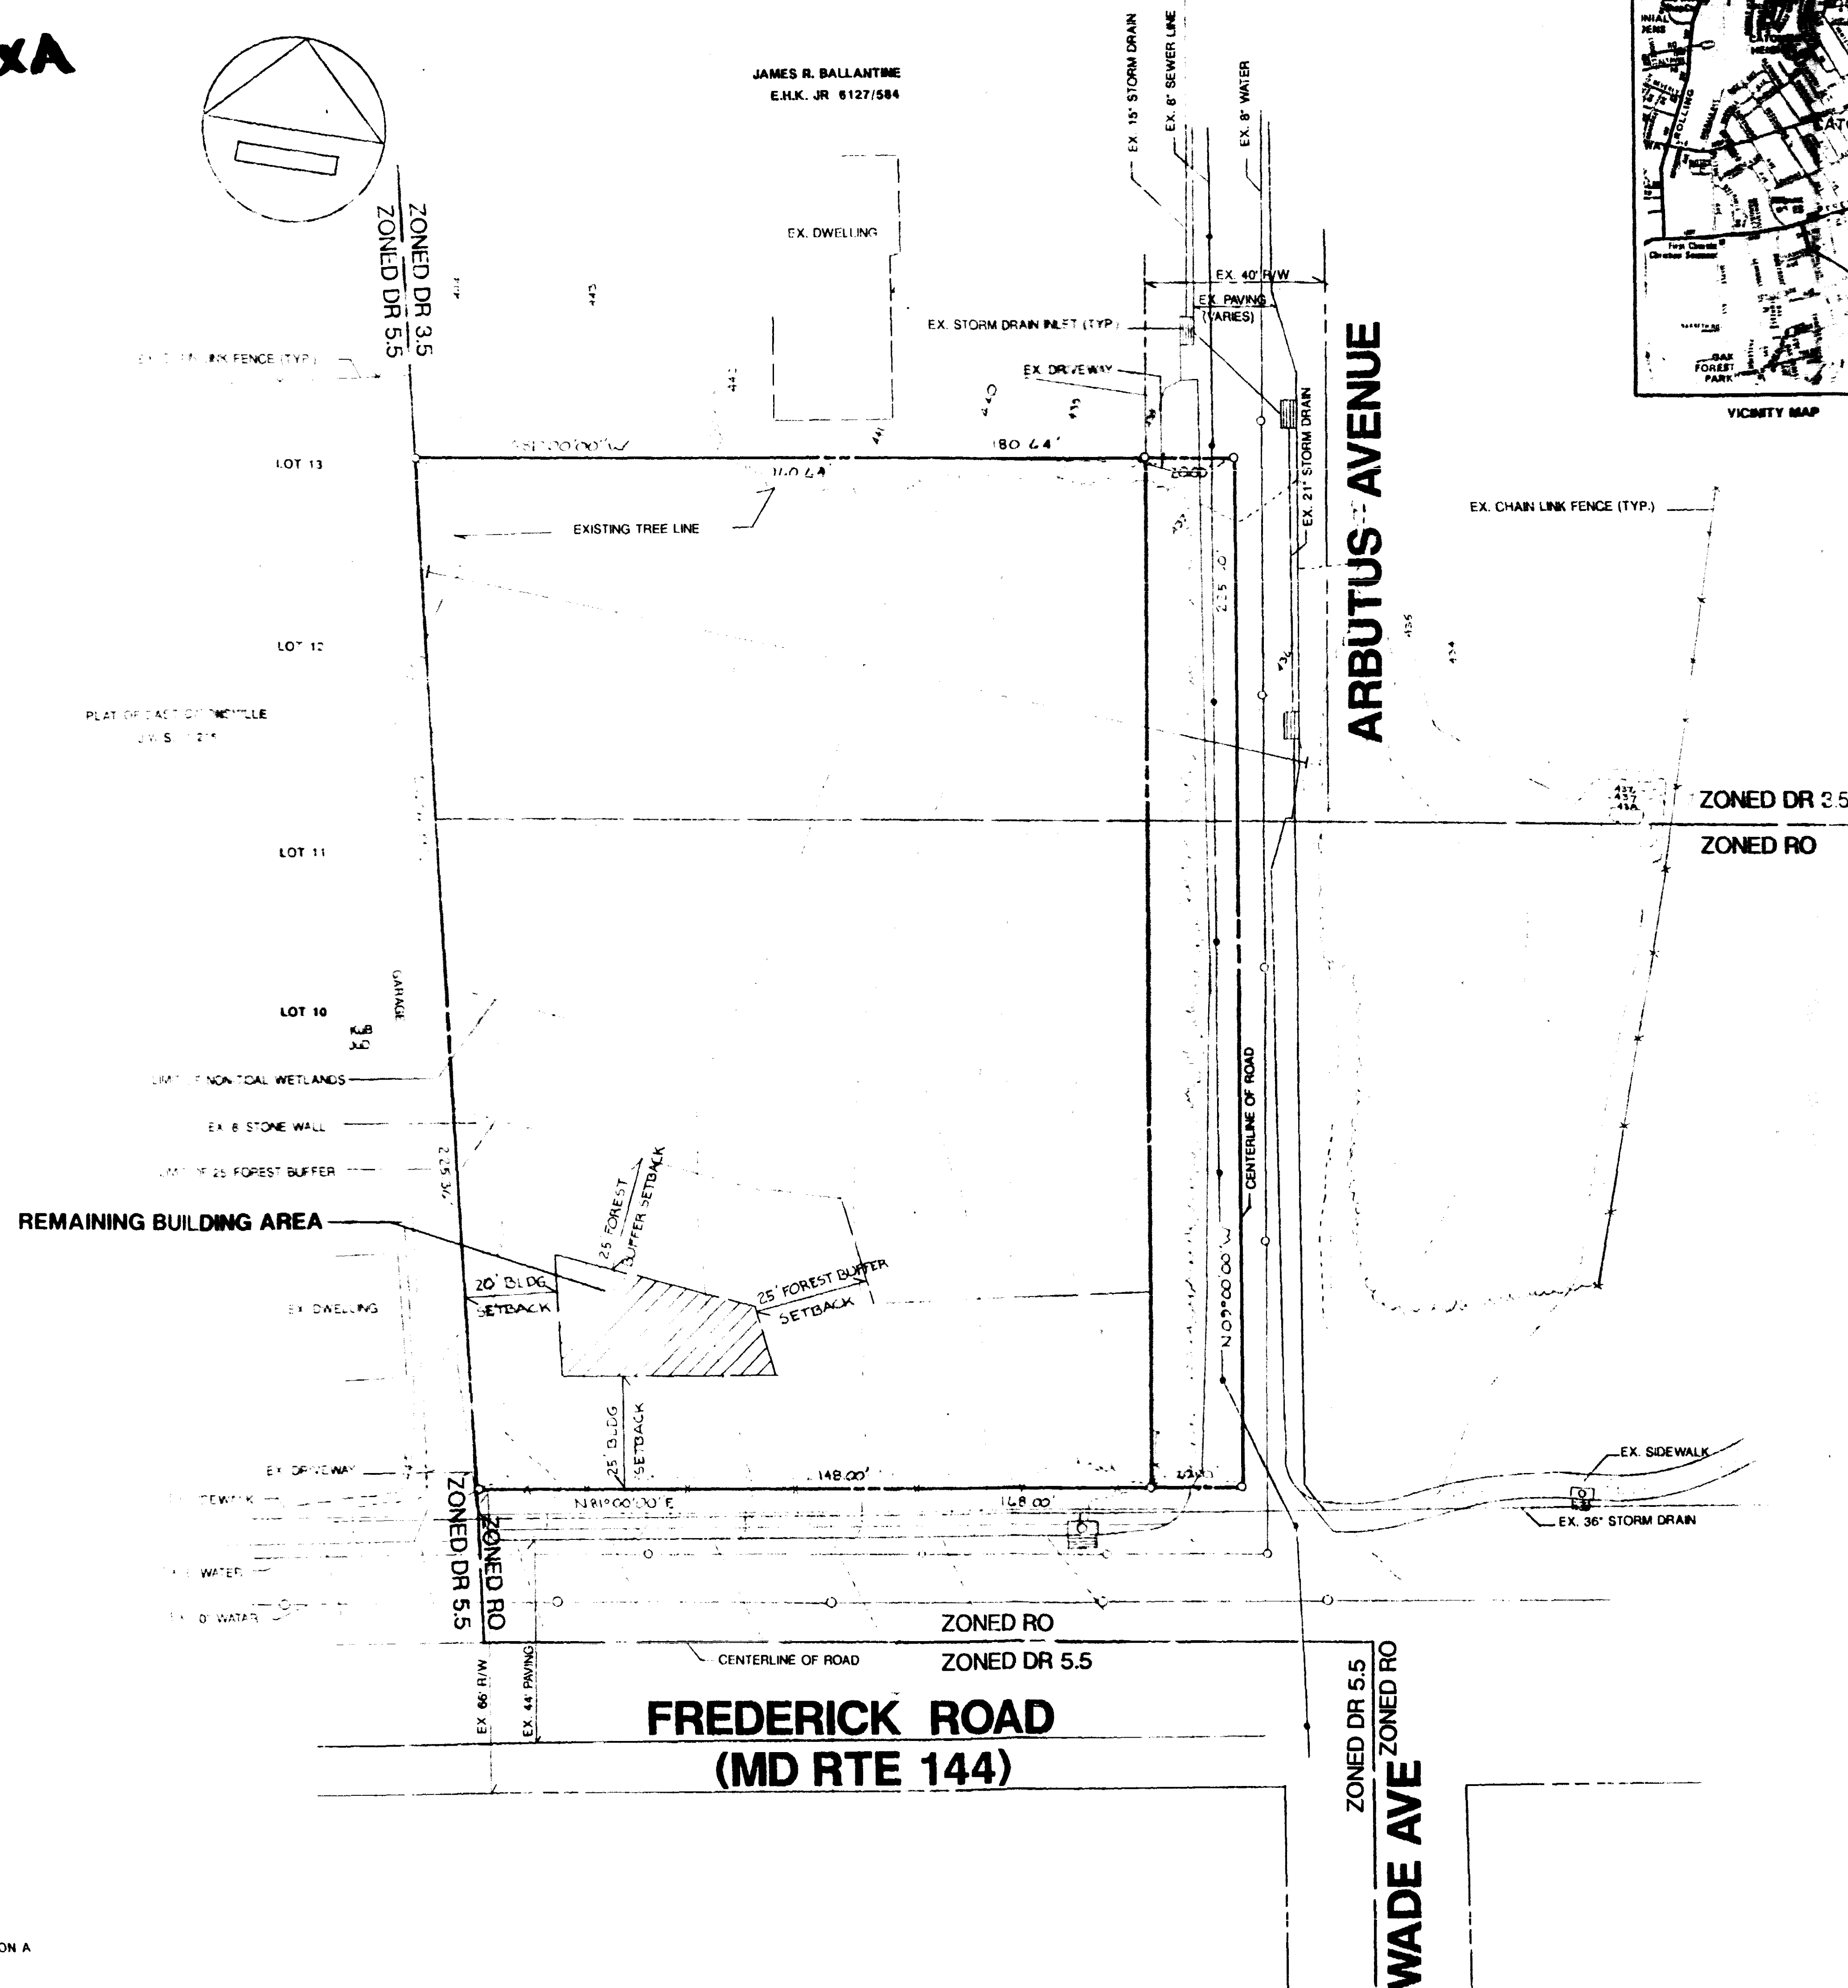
EXISTING CONDITIONS PLAN
